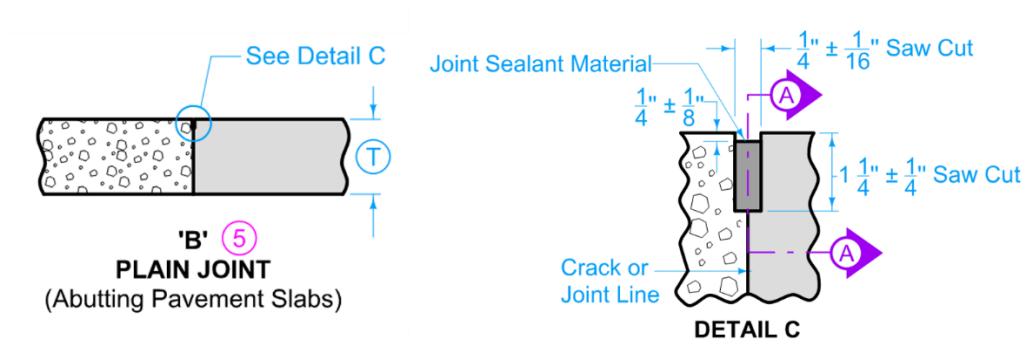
Schematic showing B joint according to Iowa DOT standards (IowaDOT Standard Road Plans).
